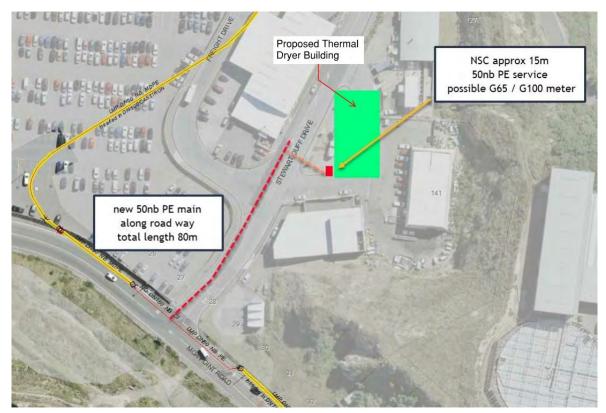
Proposed Gas Connection for the new Sludge Minimisation Facility.
